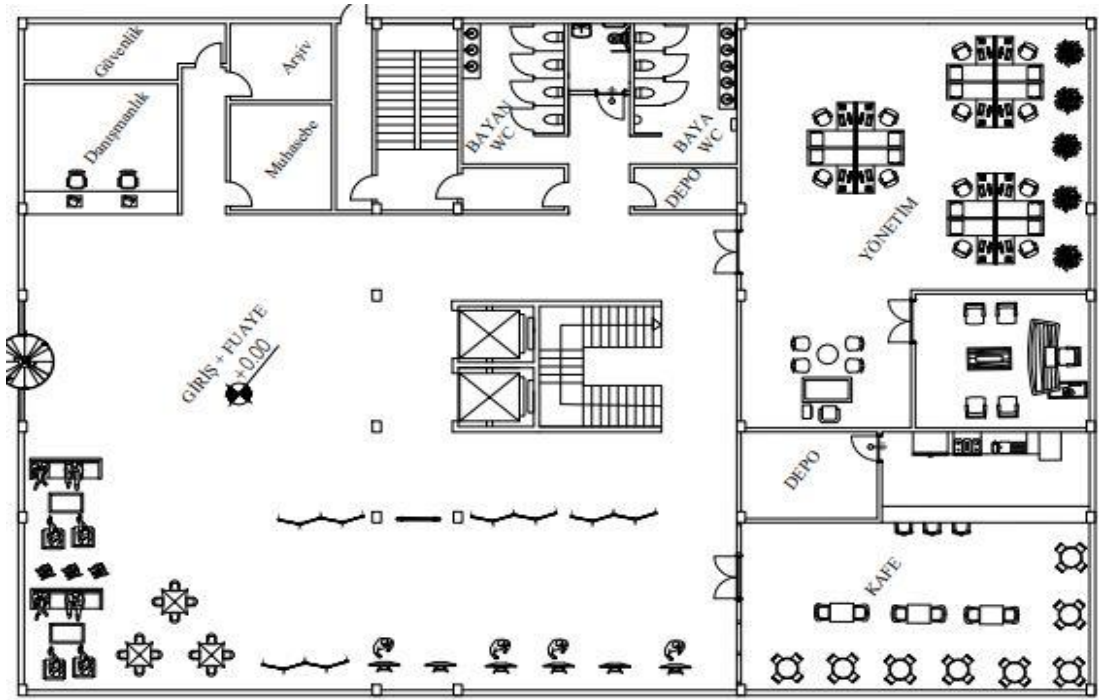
The ground floor of the architectural plan (AutoCAD, 2019)
